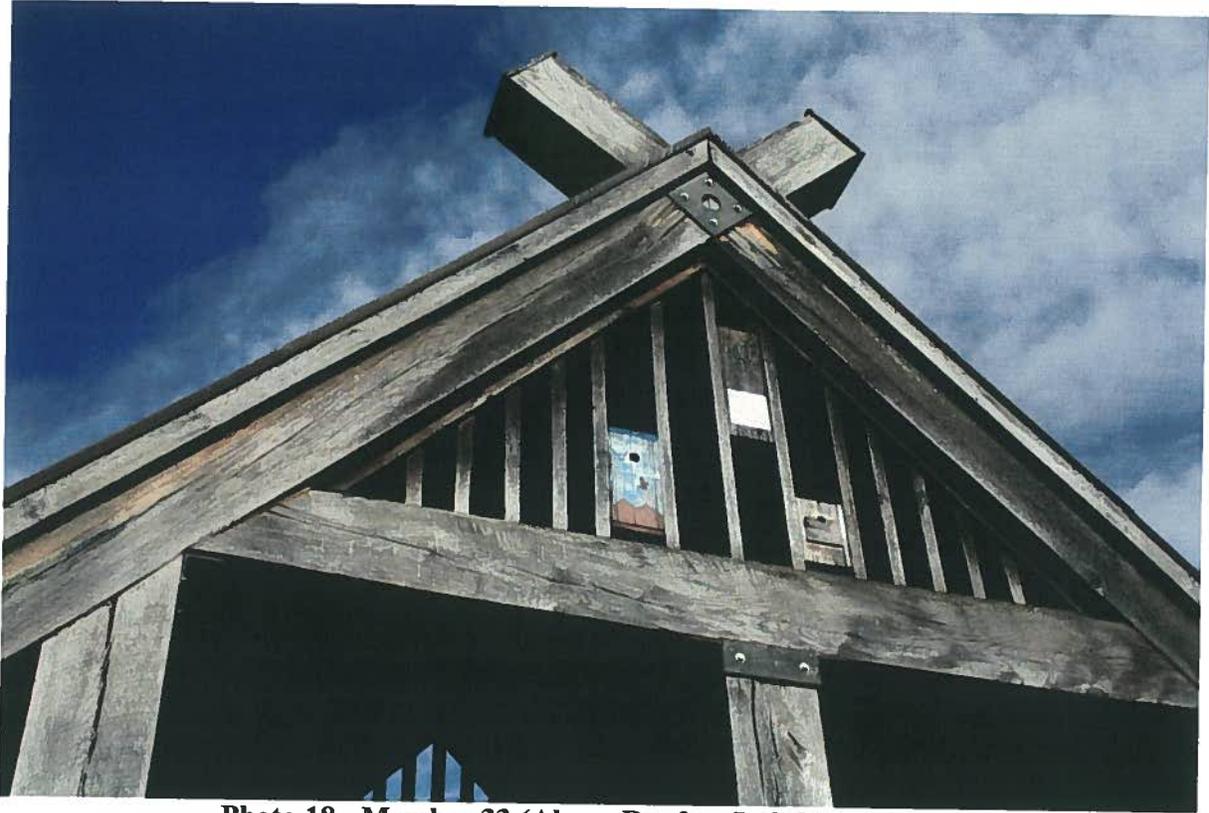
Member 33 (Above Roof on Left-Not Labelled)
